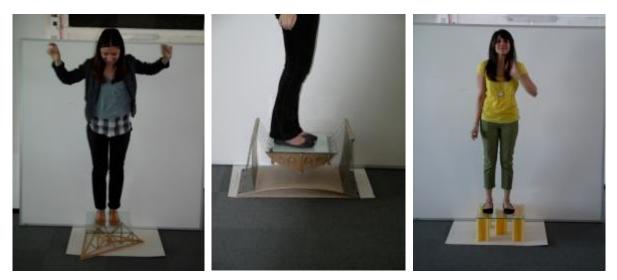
Glass floor project (2008) – Students were asked to design and build a platform that would support their own weight 200mm above the ground; the floor of the platform was float glass – 400mm x 400mm x 6mm.
